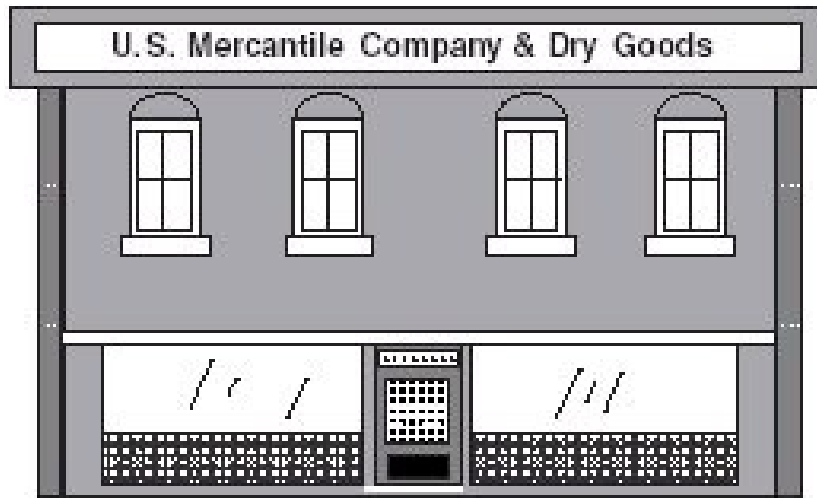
Typical two-story commercial building with load bearing, masonry side walls.
